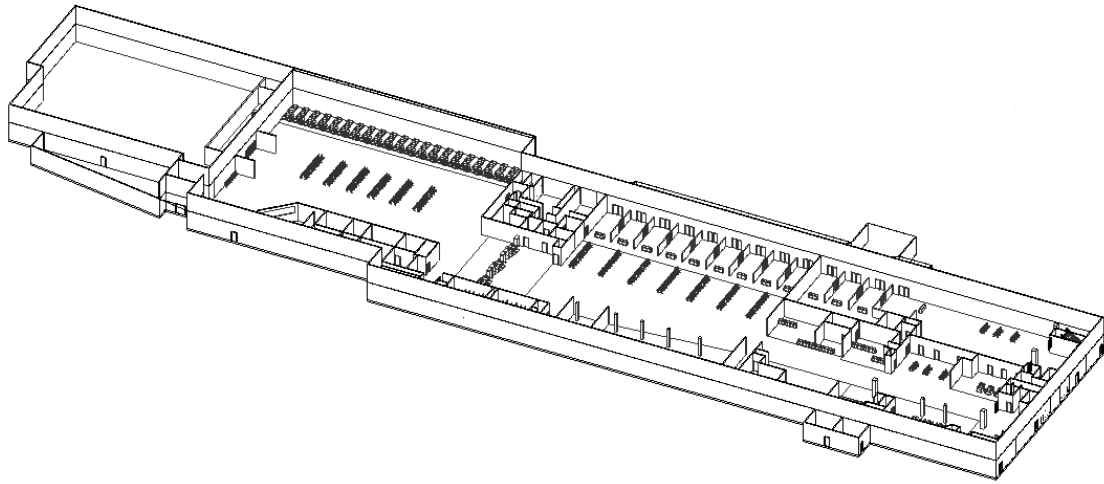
Terminal A 3D Front Interior View (without Roof, Ceilings and Hidden First Floor)
